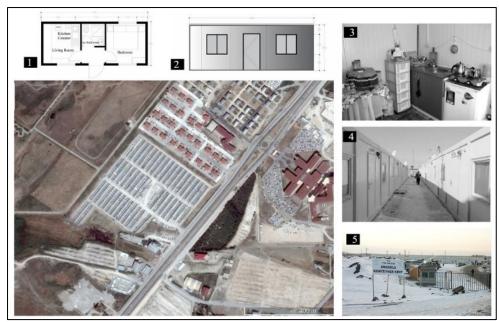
Site Plan: 1. floor plan; 2.facade; 3.kitchen (source: Unal, 2017); 4. Exterior (URL 3); 5.settlement view (URL 4)
